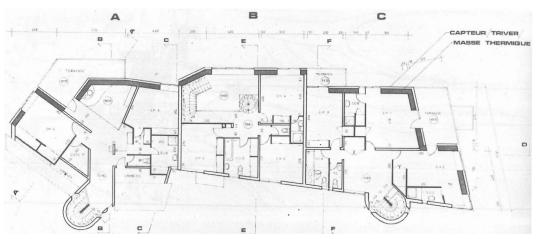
Single solar house in Odeillo. Detached house with Trombe wall, built in 1967 in Odeillo, France. (Architecture d'Aujourd'hui, 4/1977)
